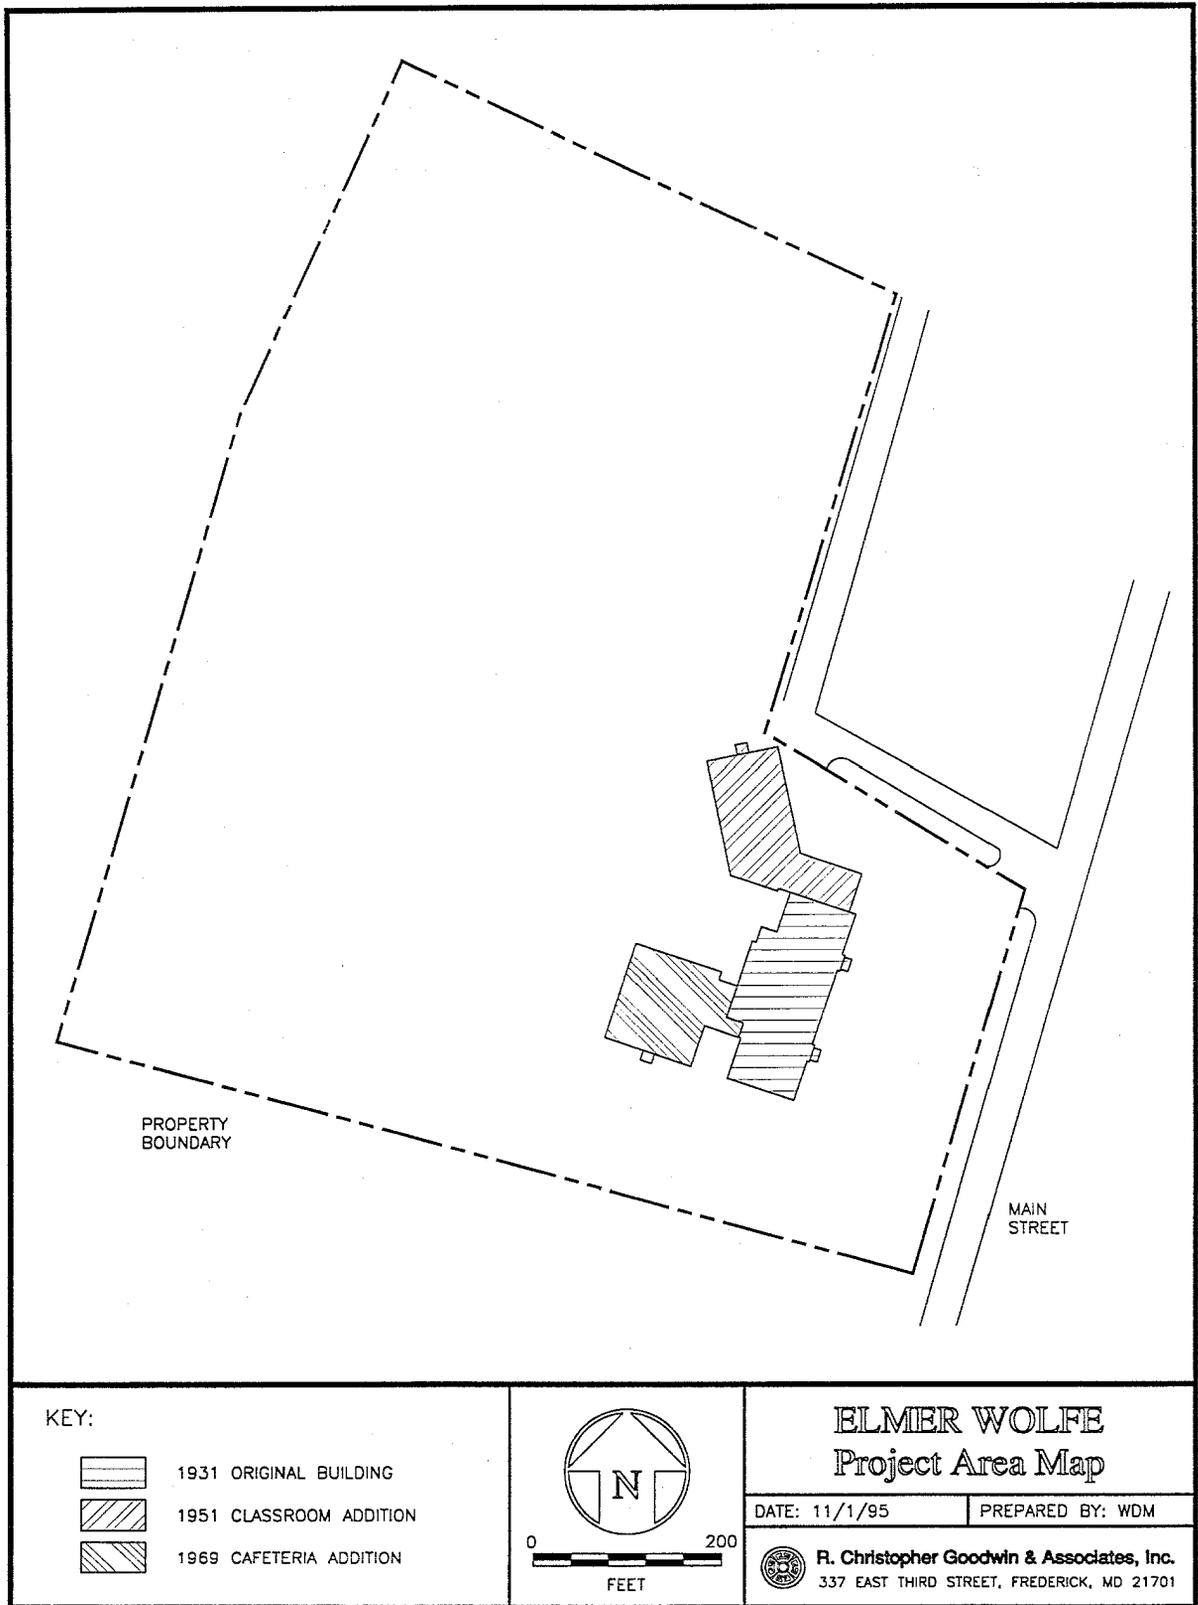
Elmer Wolfe School Site Plan, indicating three phases of construction
